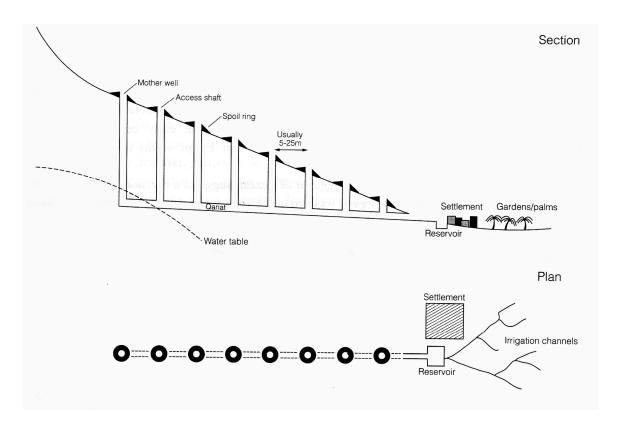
Schematic cross-section and plan of a typical qanat system [Wilson 2003a, fig. 11].
